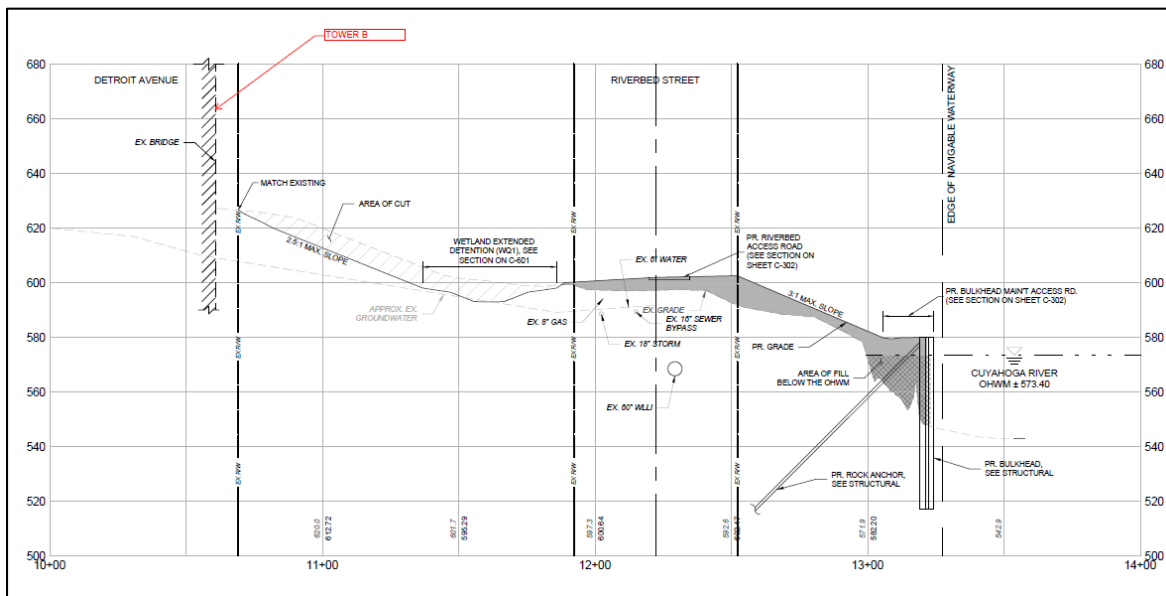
A – IRISHTOWN BEND PROJECT - RETAINING WALL AND DEEP FOUNDATION IMPROVMENTS ADJACENT TO TOWER B
